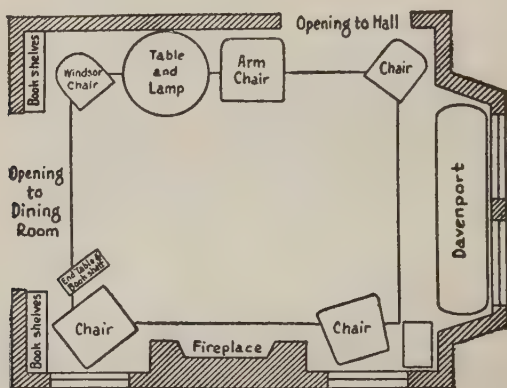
Floor Plan of the Living Room in a Six-Room Flat
